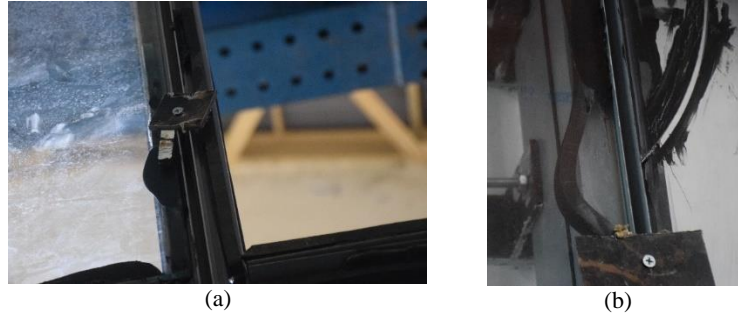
(a)Tilted clip placed on intermediate mullion (b) Squeezed silicon and damaged silicon tape of the concrete frame
